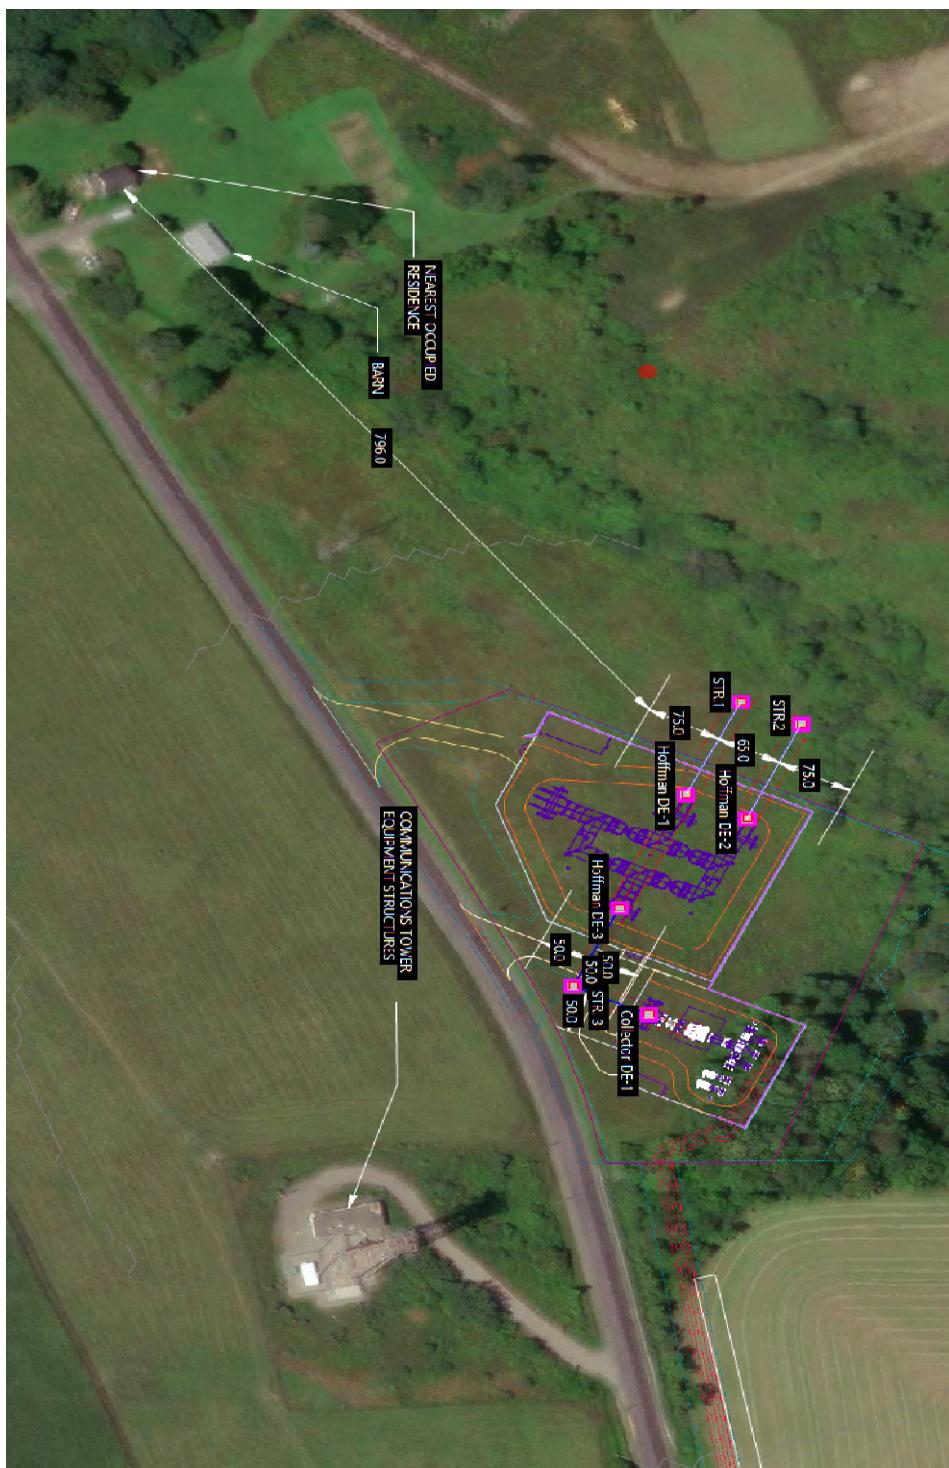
Aerial Imagery Showing plan View of Nearest occupied residence *All Dimensions shown are in feet
